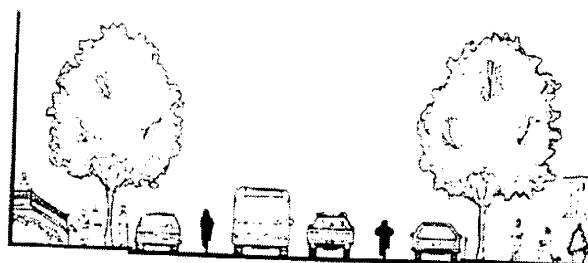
Cross-section of a bike lane between travel lanes and on-street parallel parking
